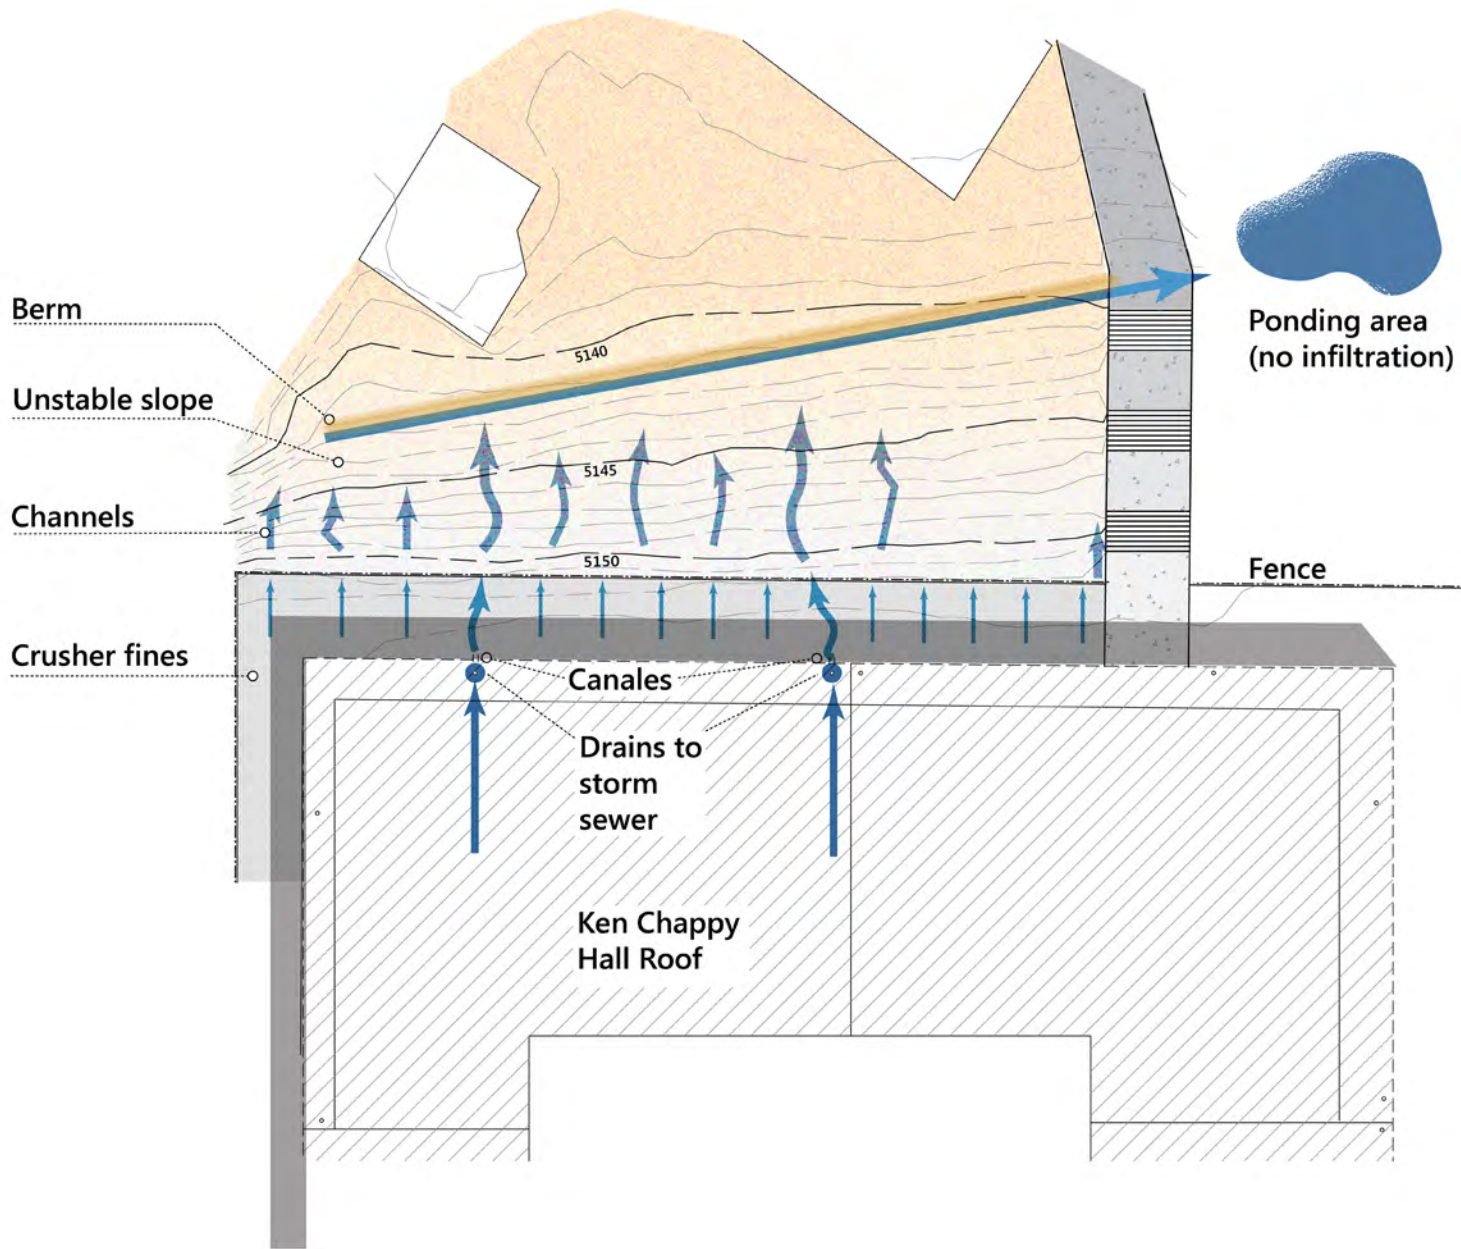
Existing Roof and Slope Conditions and Drainage (figure by author)
